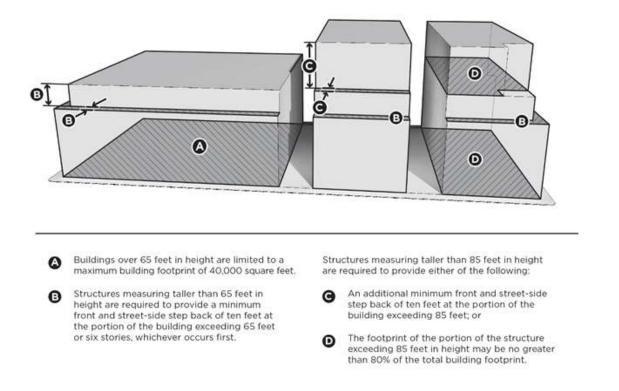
BUILDING HEIGHT AND UPPER-STORY STEPBACKS WHEN NOT USING TOWER DESIGN OPTIONS
